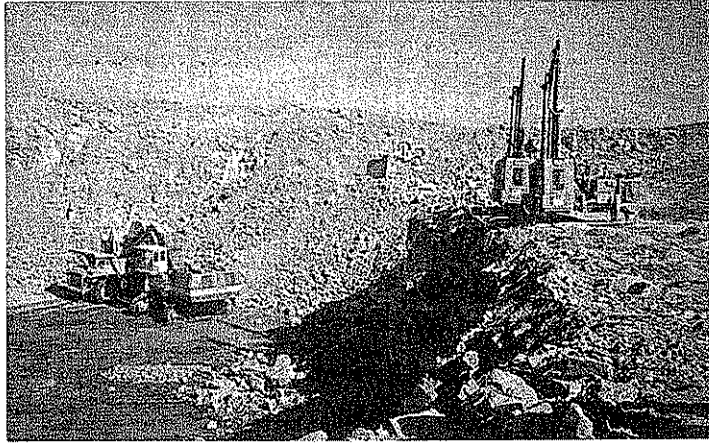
Rockfill quarry with drill rigs, excavator and dump truck.
